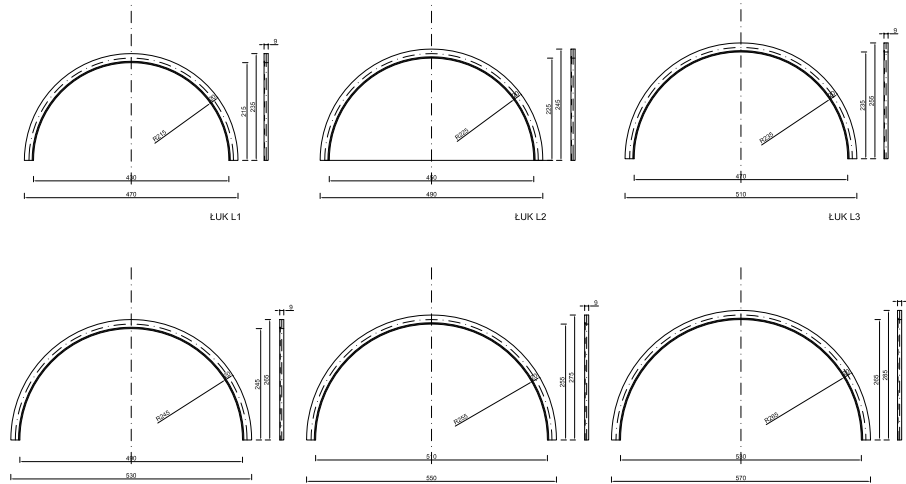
WUST Pavilion, version 3, different-sized arches for pavilion construction, 2014
